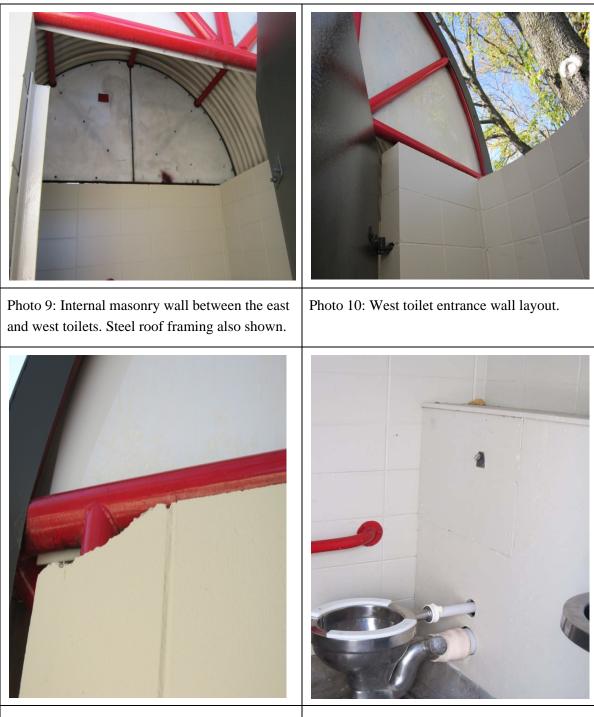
Impact damage to top of masonry wall Pho above west toilet entrance.
